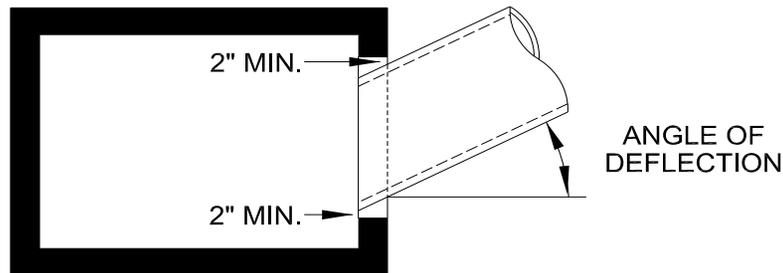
Angle of Deflection of Arched Concrete Pipes Entering and Exiting Inlet Boxes
